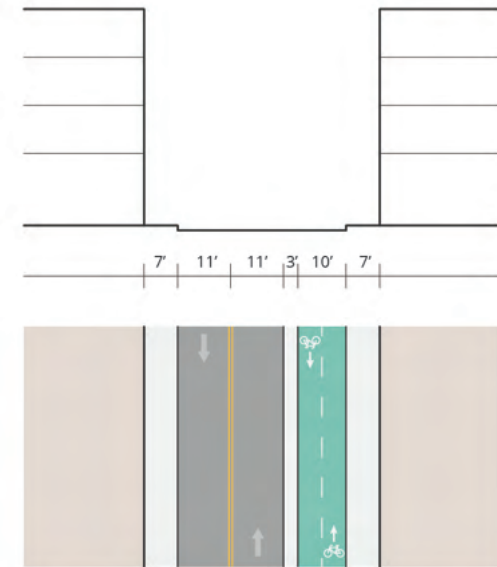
WALLEY STREET - PROPOSED CONDITION WITH TWO-WAY SEPARATED BIKE LANE
